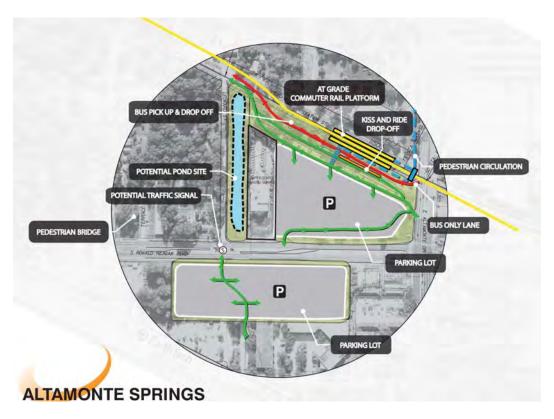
Conceptual Station Site Plan – Altamonte Springs
